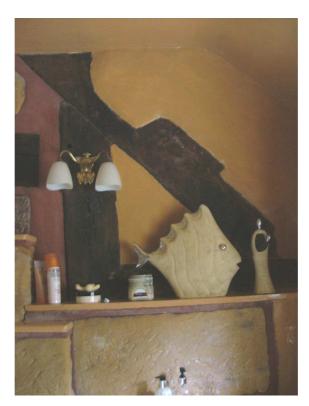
Western side of former roof truss showing notch for former purlin in outer edge of rafter, bathroom
